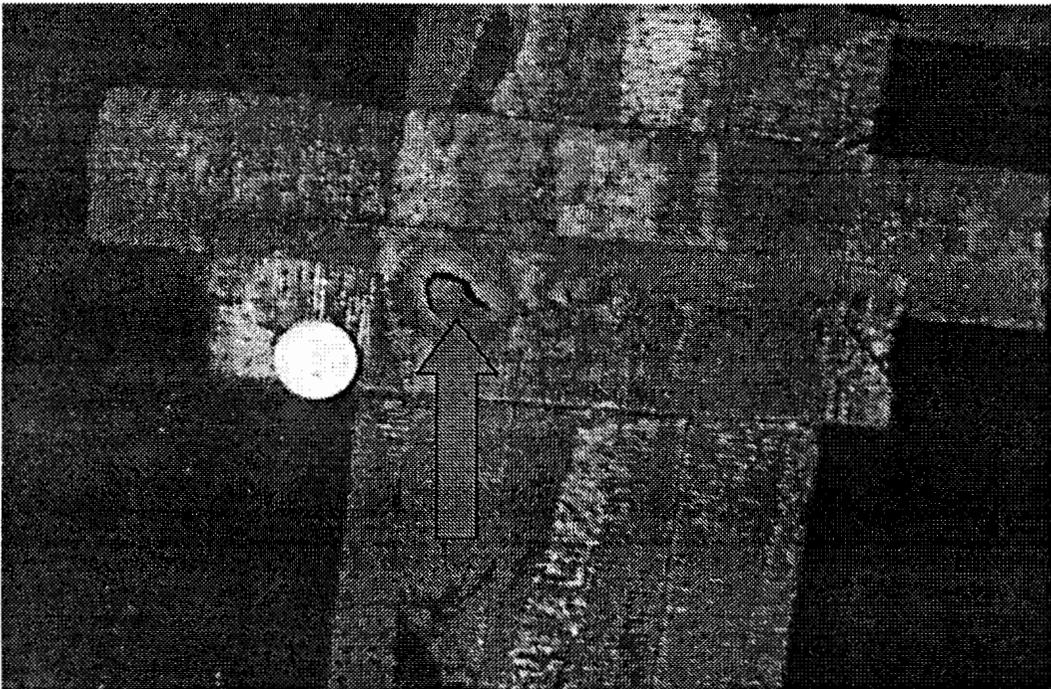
Roof hole in close proximity to vent pipe over drill hole.
